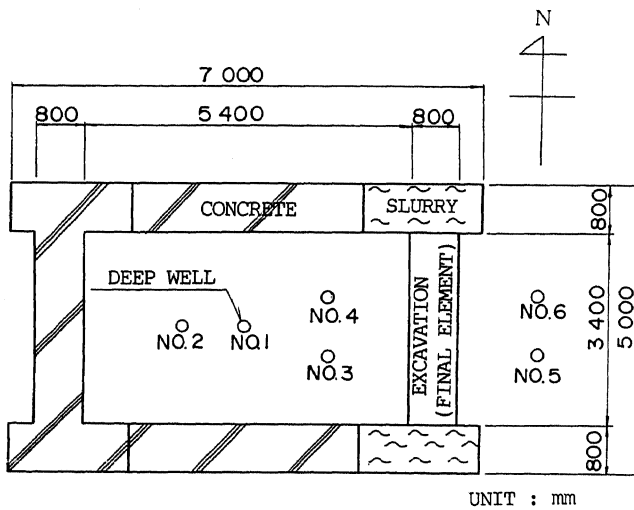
Sectional Plan of Small-Sectioned Diaphragm Wall Foundation
